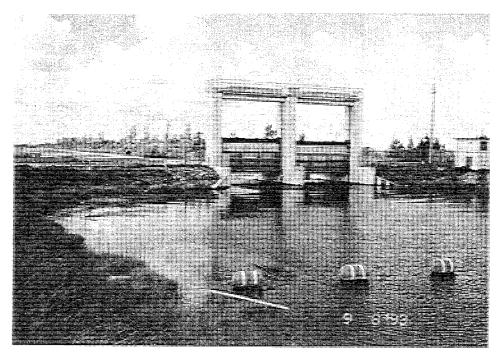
LOOKING DOWNSTREAM AT S-18C ON C-111.
